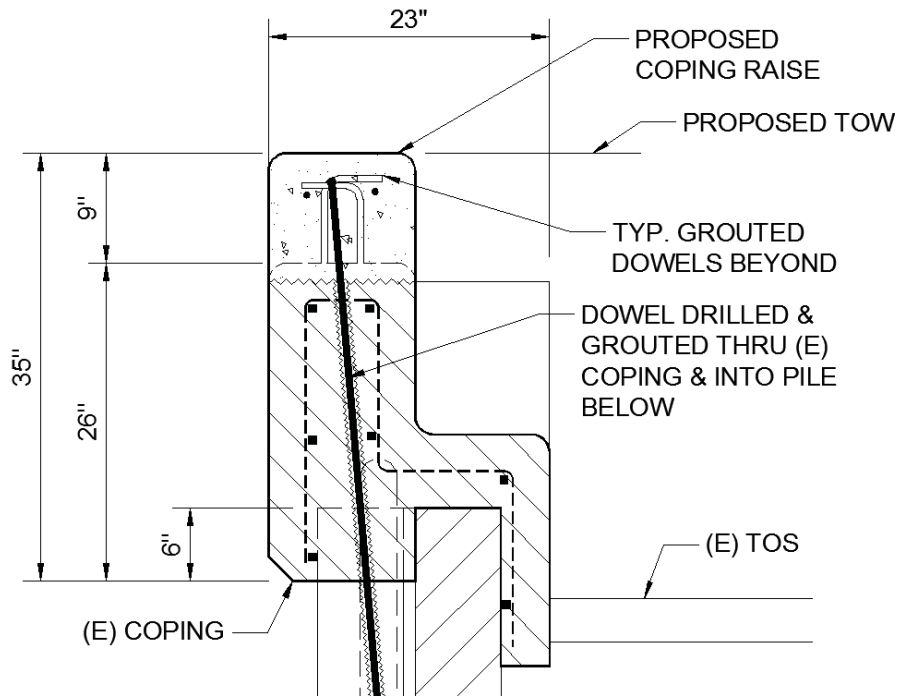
Detail of Proposed Connection between (E) Coping and (E) Pile
